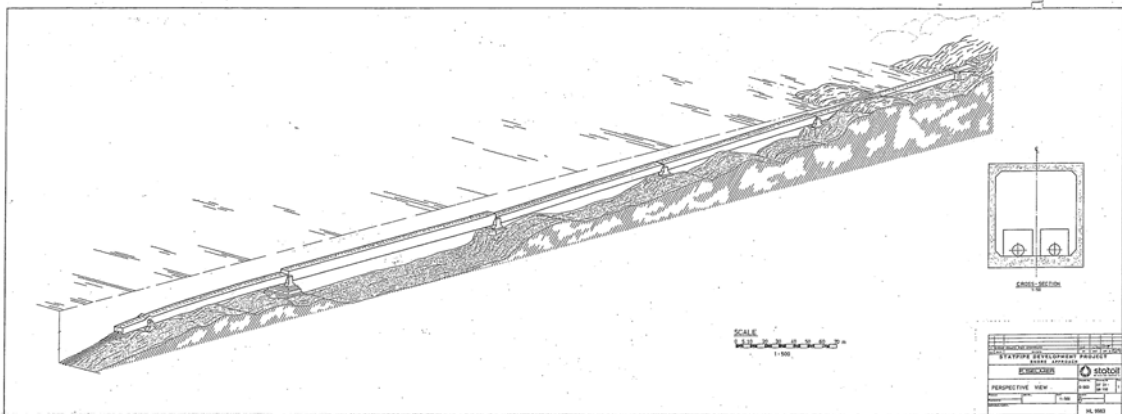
Submerged concrete bridge (tunnel) at Karmøy
